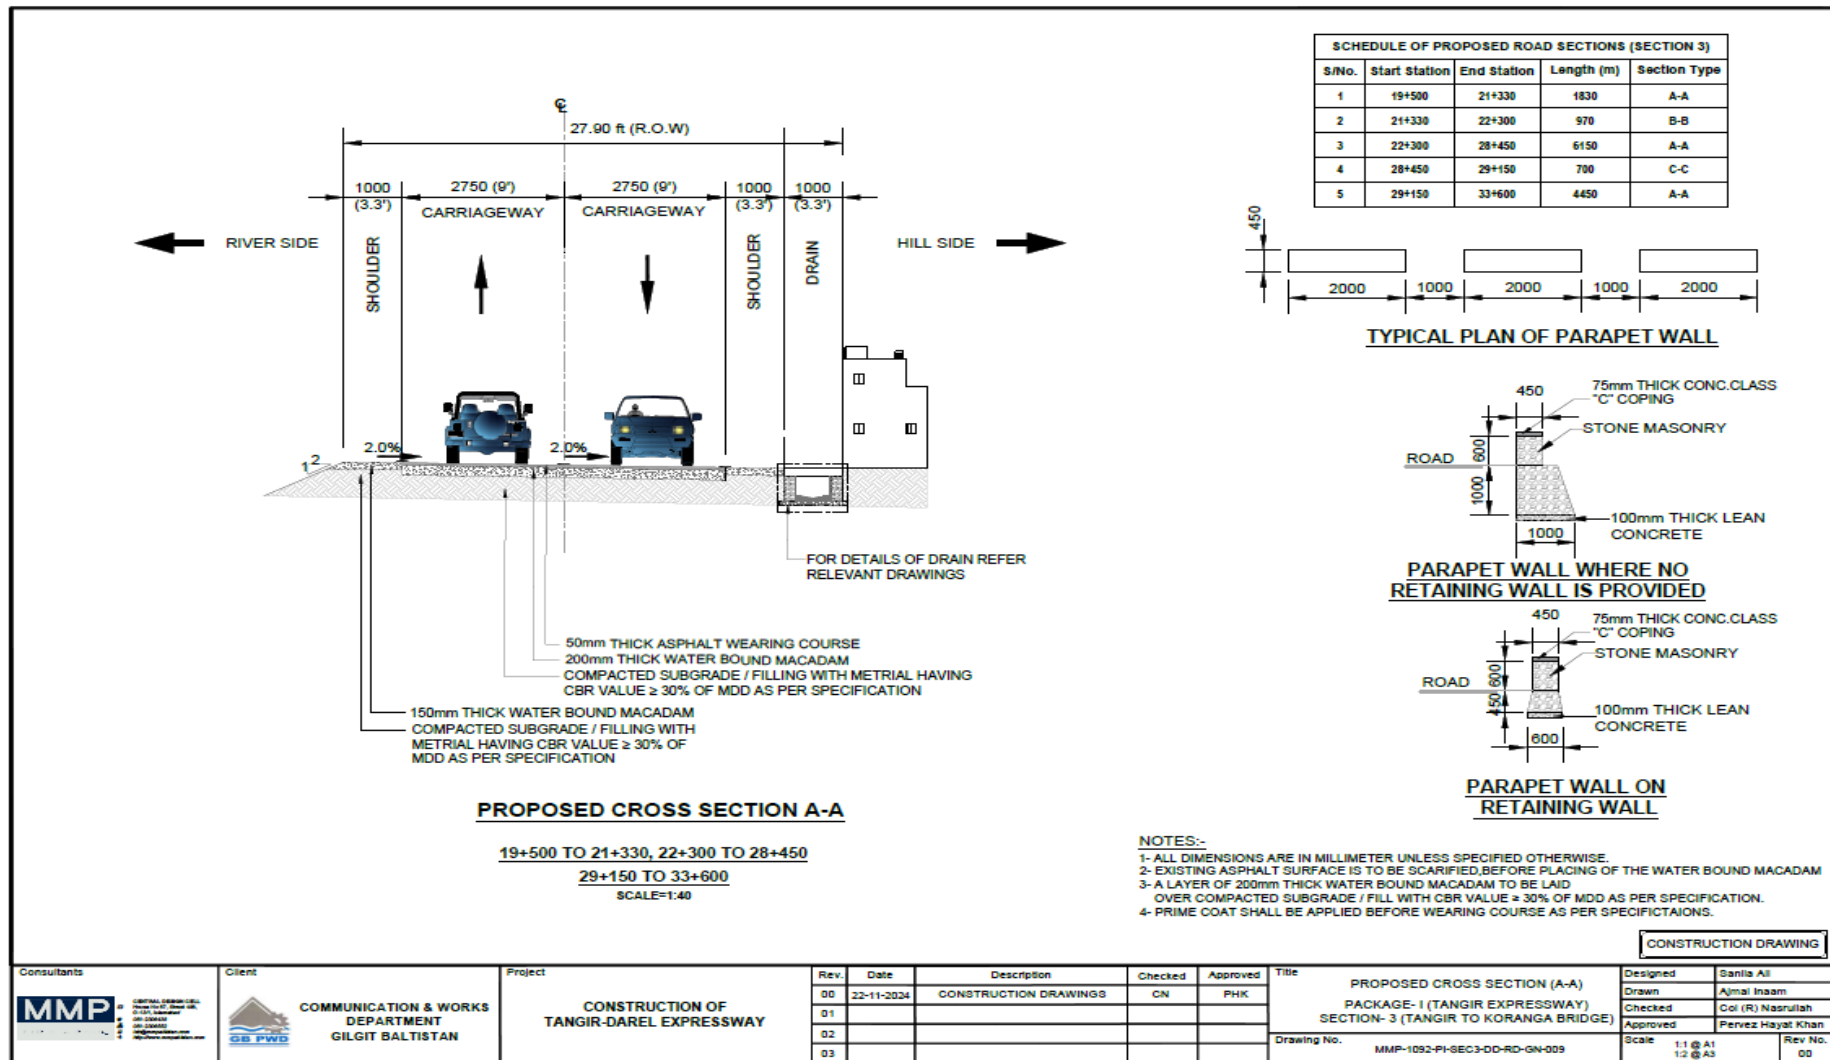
Typical Cross-section of Tangir Expressway (Package -I Section-3)
